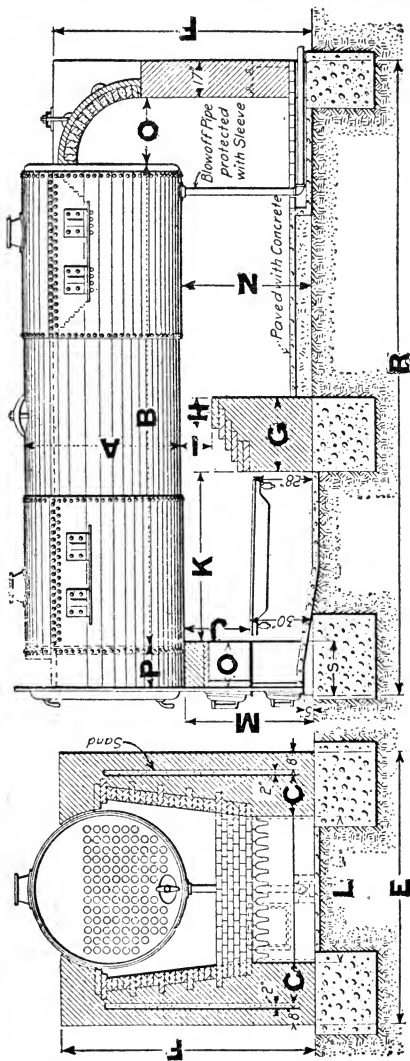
,462.—Setting design for overhanging front boiler. The dimension letters refer to the accompanying table of dimensions for boiler setting.
